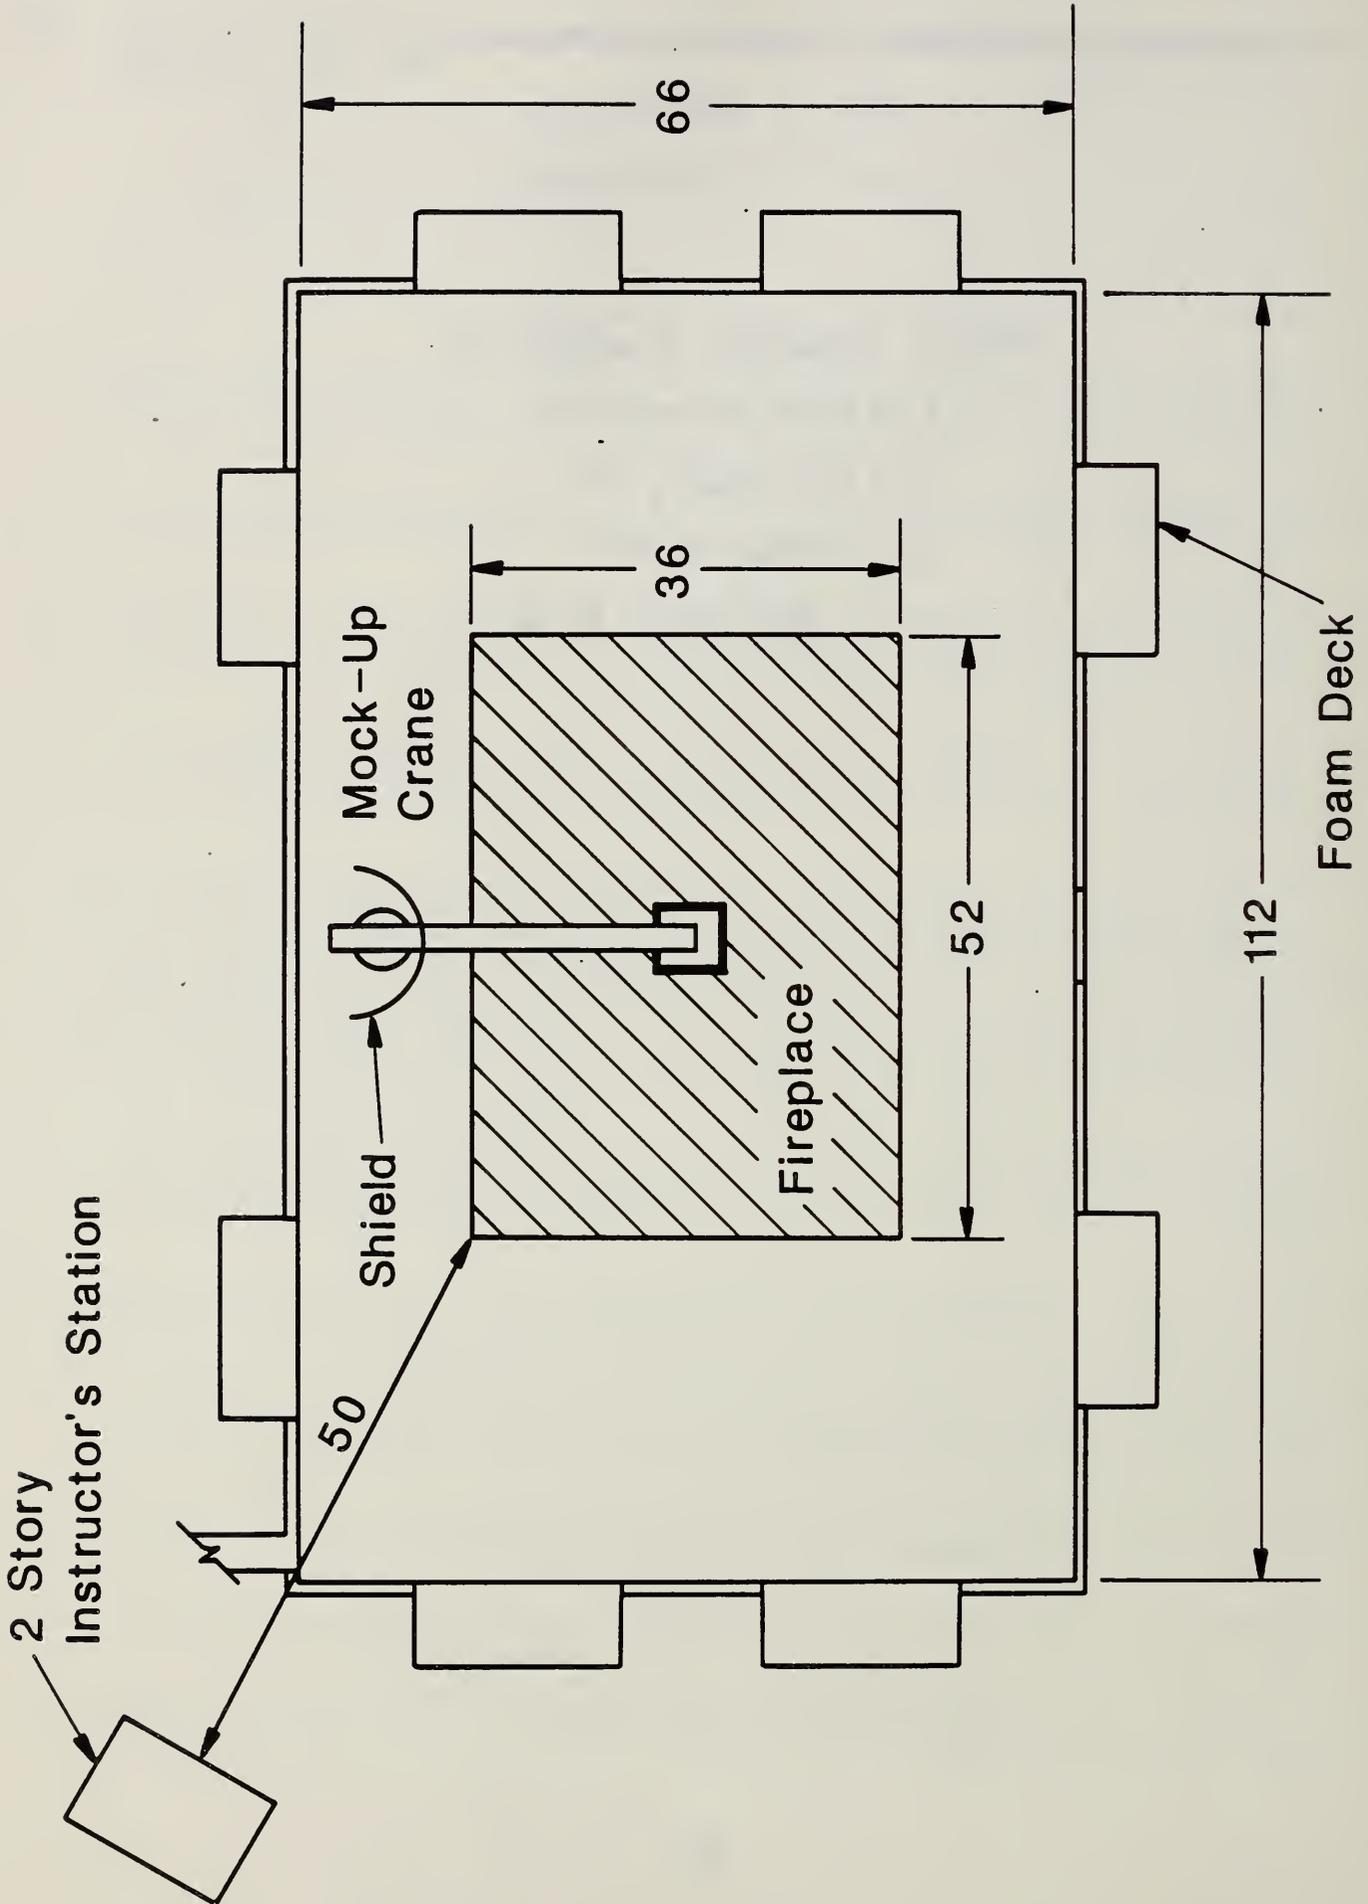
Plan view of 19F4 trainer facility (all dimensions in feet)
